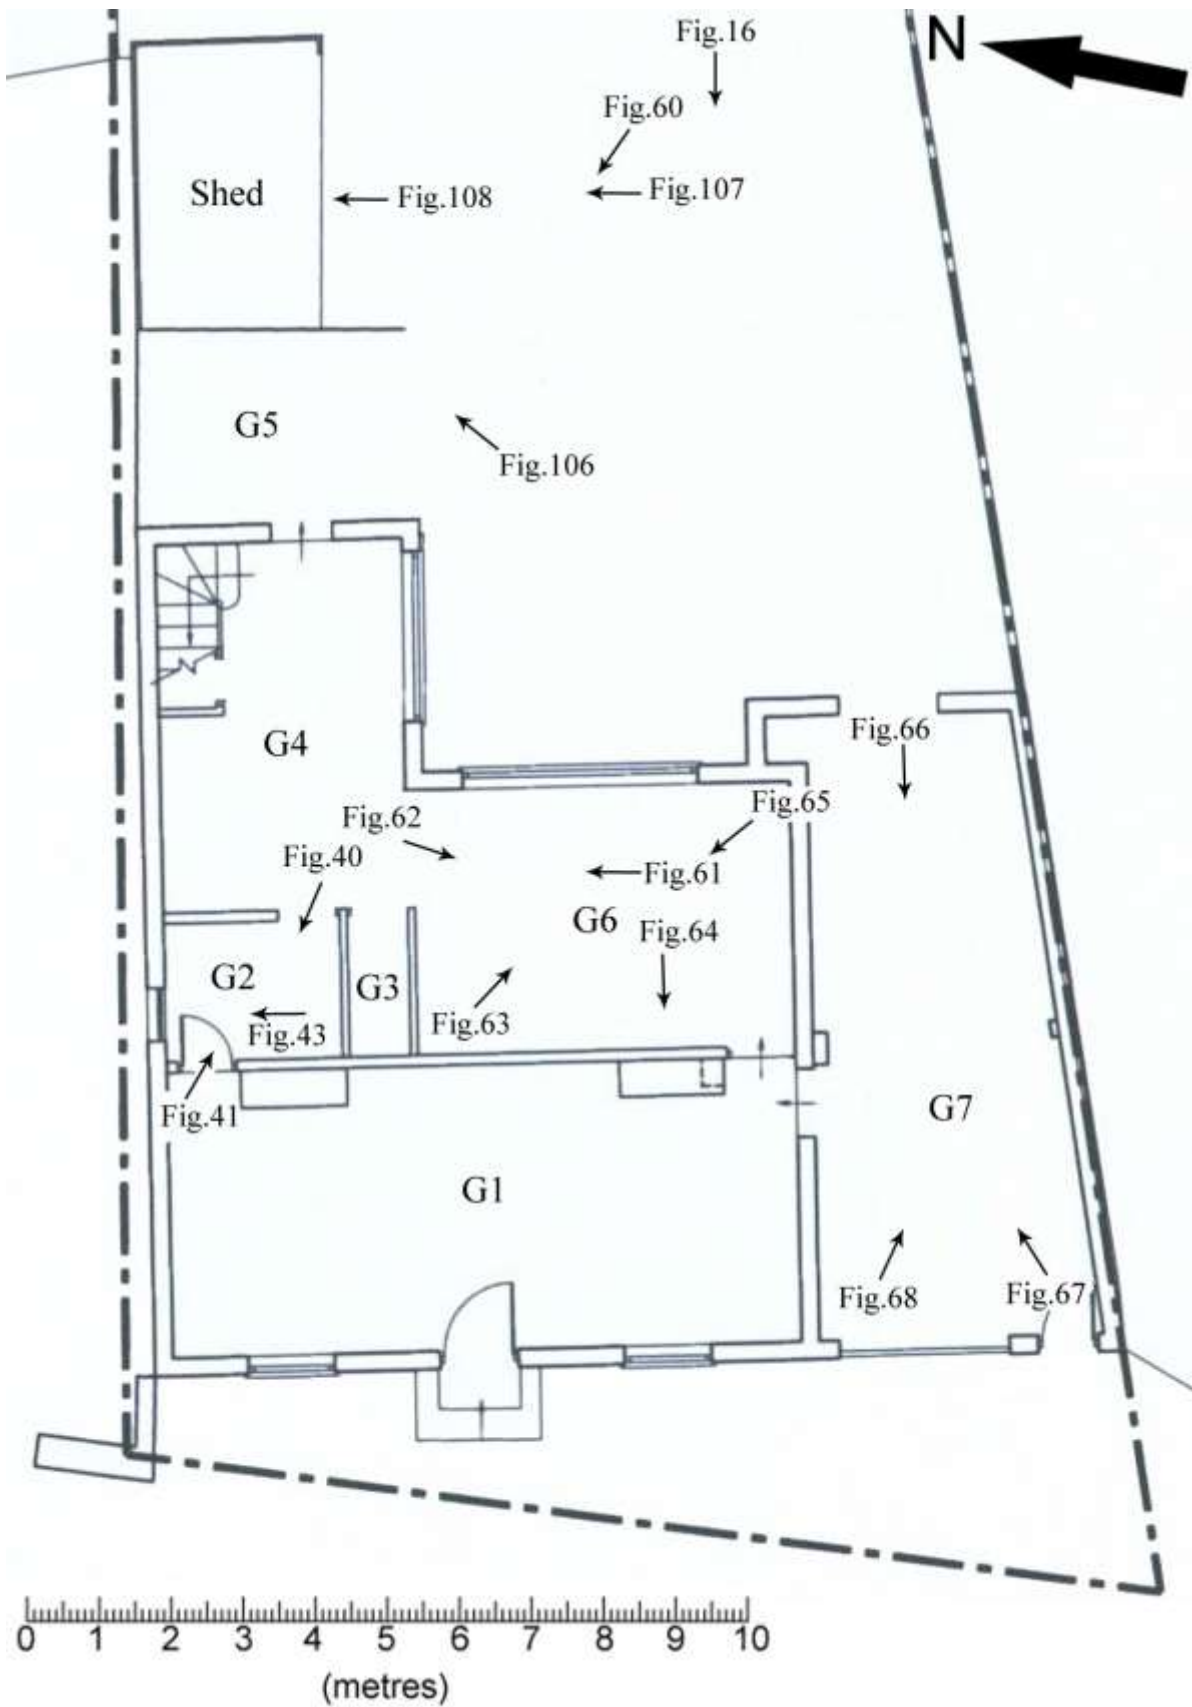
Ground floor plan showing direction of view for photos in G2, G5, G6 and G7 and shed
